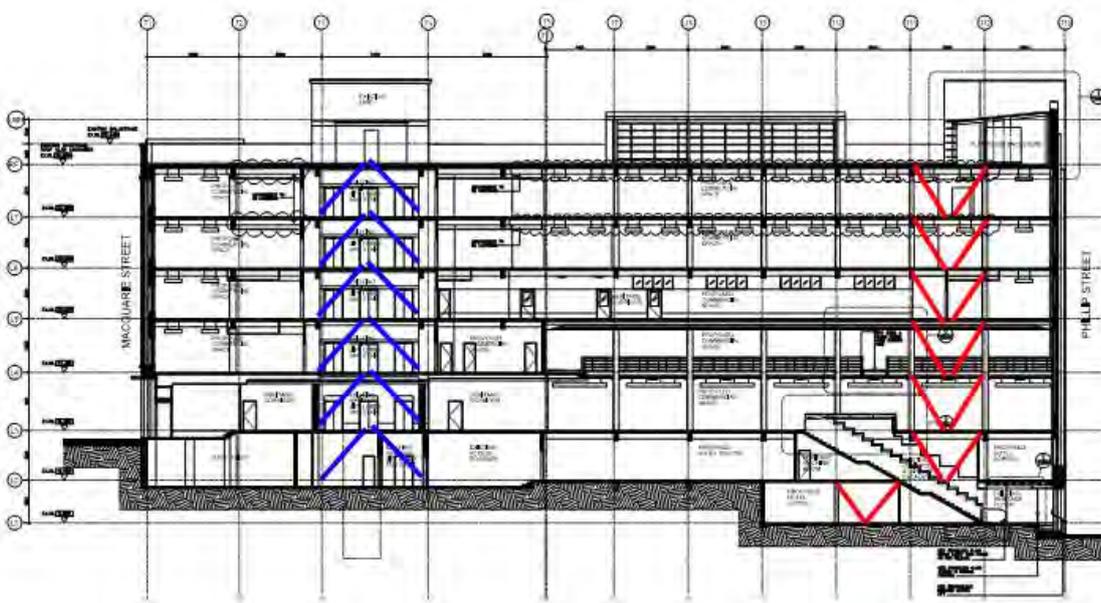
Example of 'A' frame bracing (blue) and inverted 'V' frame bracing (red)
